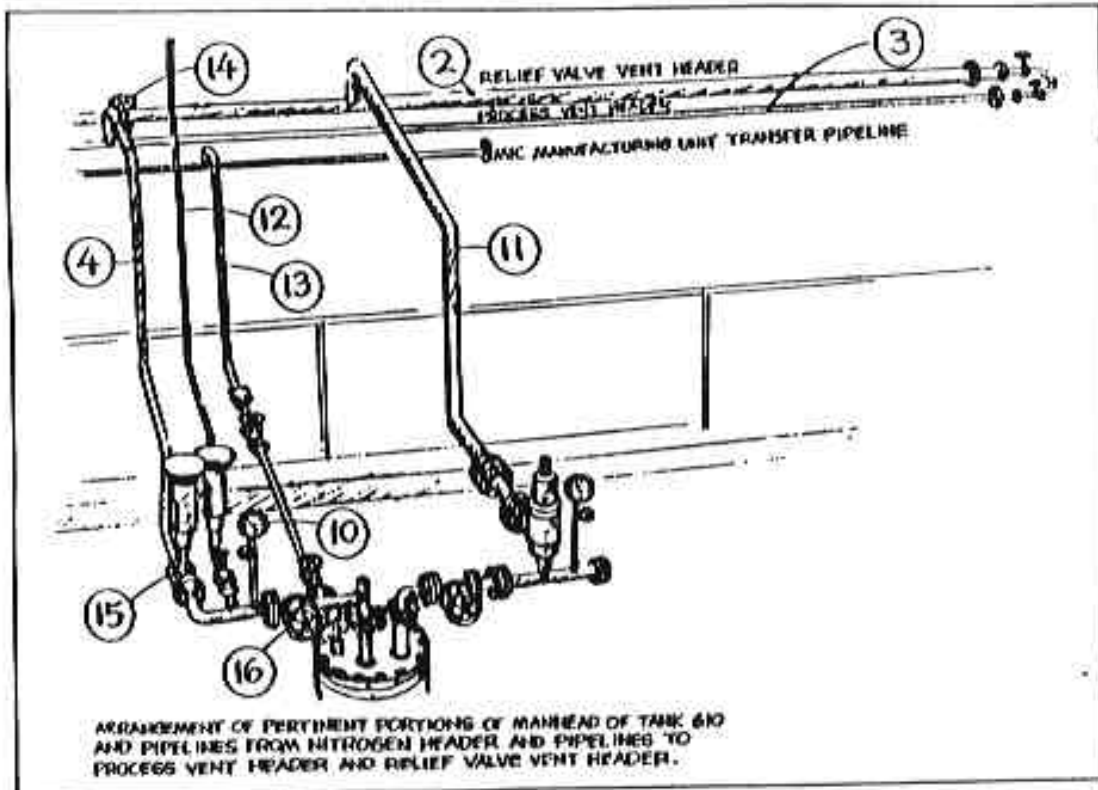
PIPING DETAIL -- TANK 610 MANHEAD AREA
